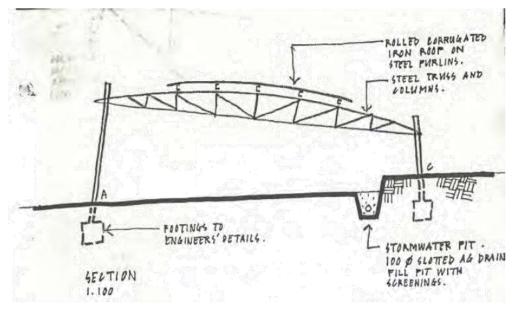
Plans for car port at the Choong House by architects Wood Marsh. (Source: BP, undated)
